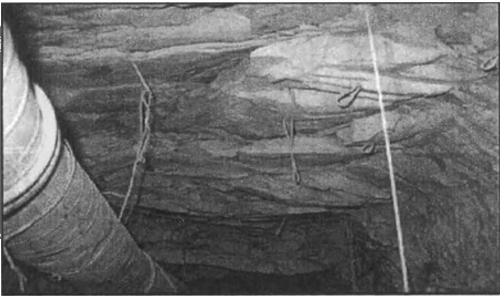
Unstable blocks supported with fully grouted rock tendons in the Hartebeestfontein tunnel. Note fall out between and around rock tendons.
